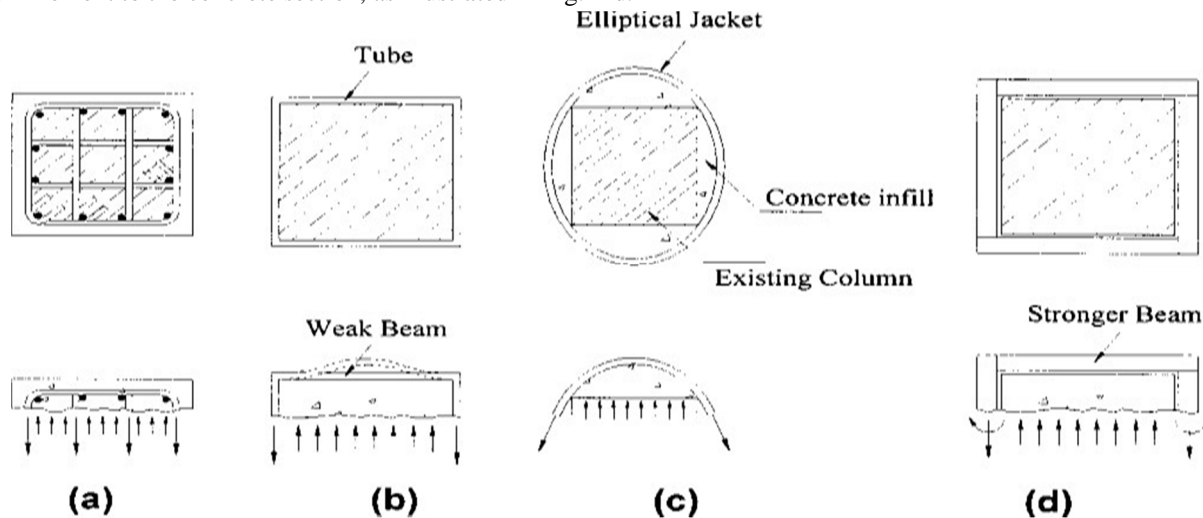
Comparison of different transverse confinements for concrete columns: (a) hoops and ties per current seismic design provisions; (b) steel tube; (c) elliptical steel jacketing; and (d) partially stiffened rectilinear jacketing
